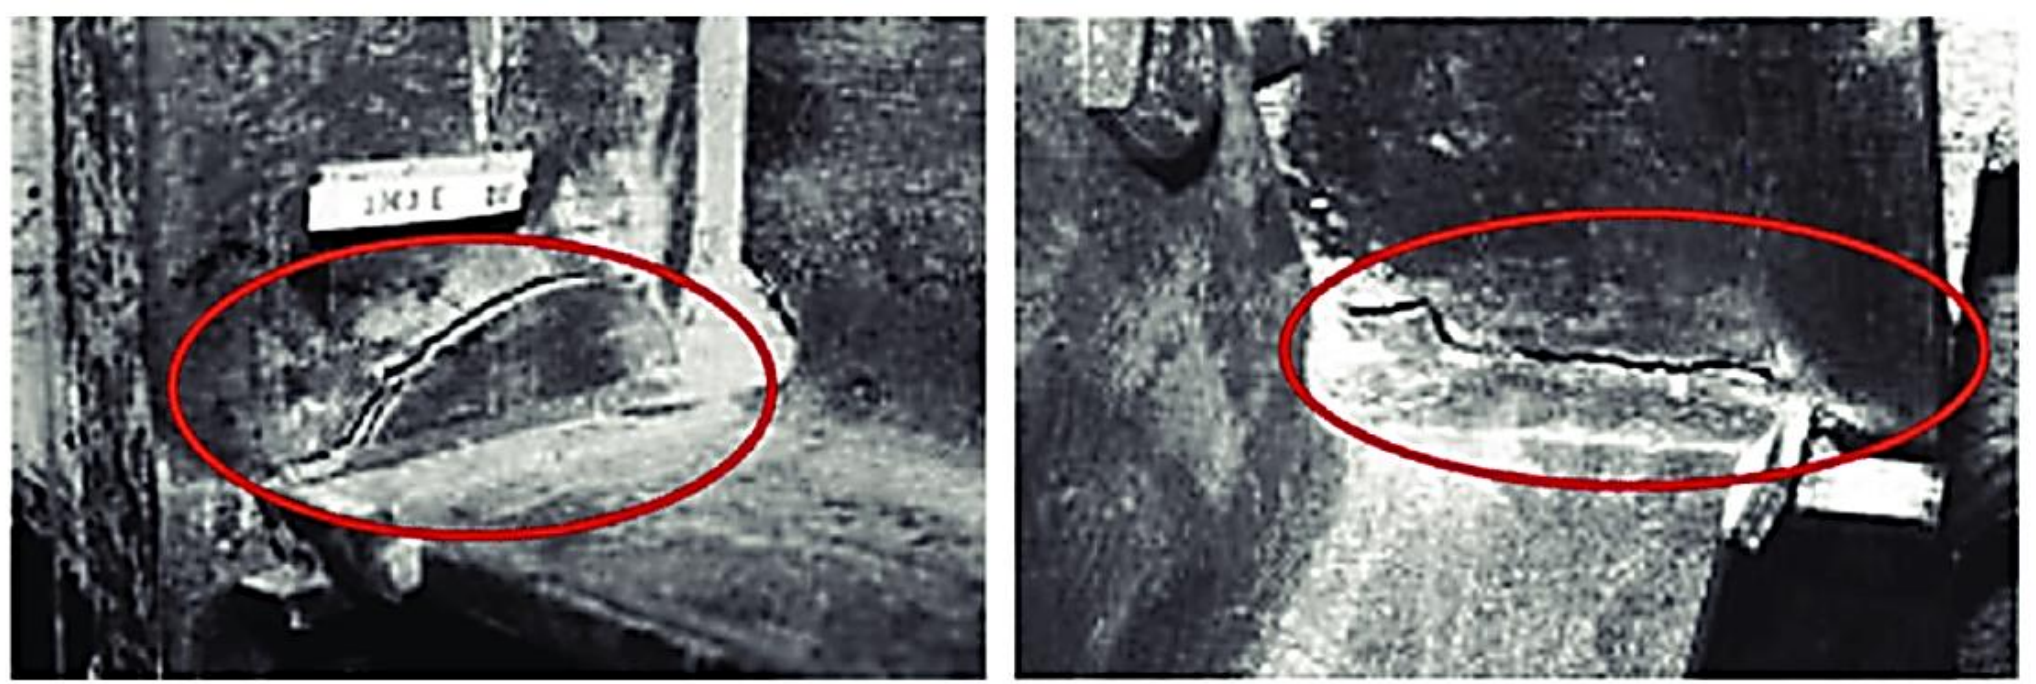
Brittle failures due to welding on beam to column connections pre-Northridge [8]
